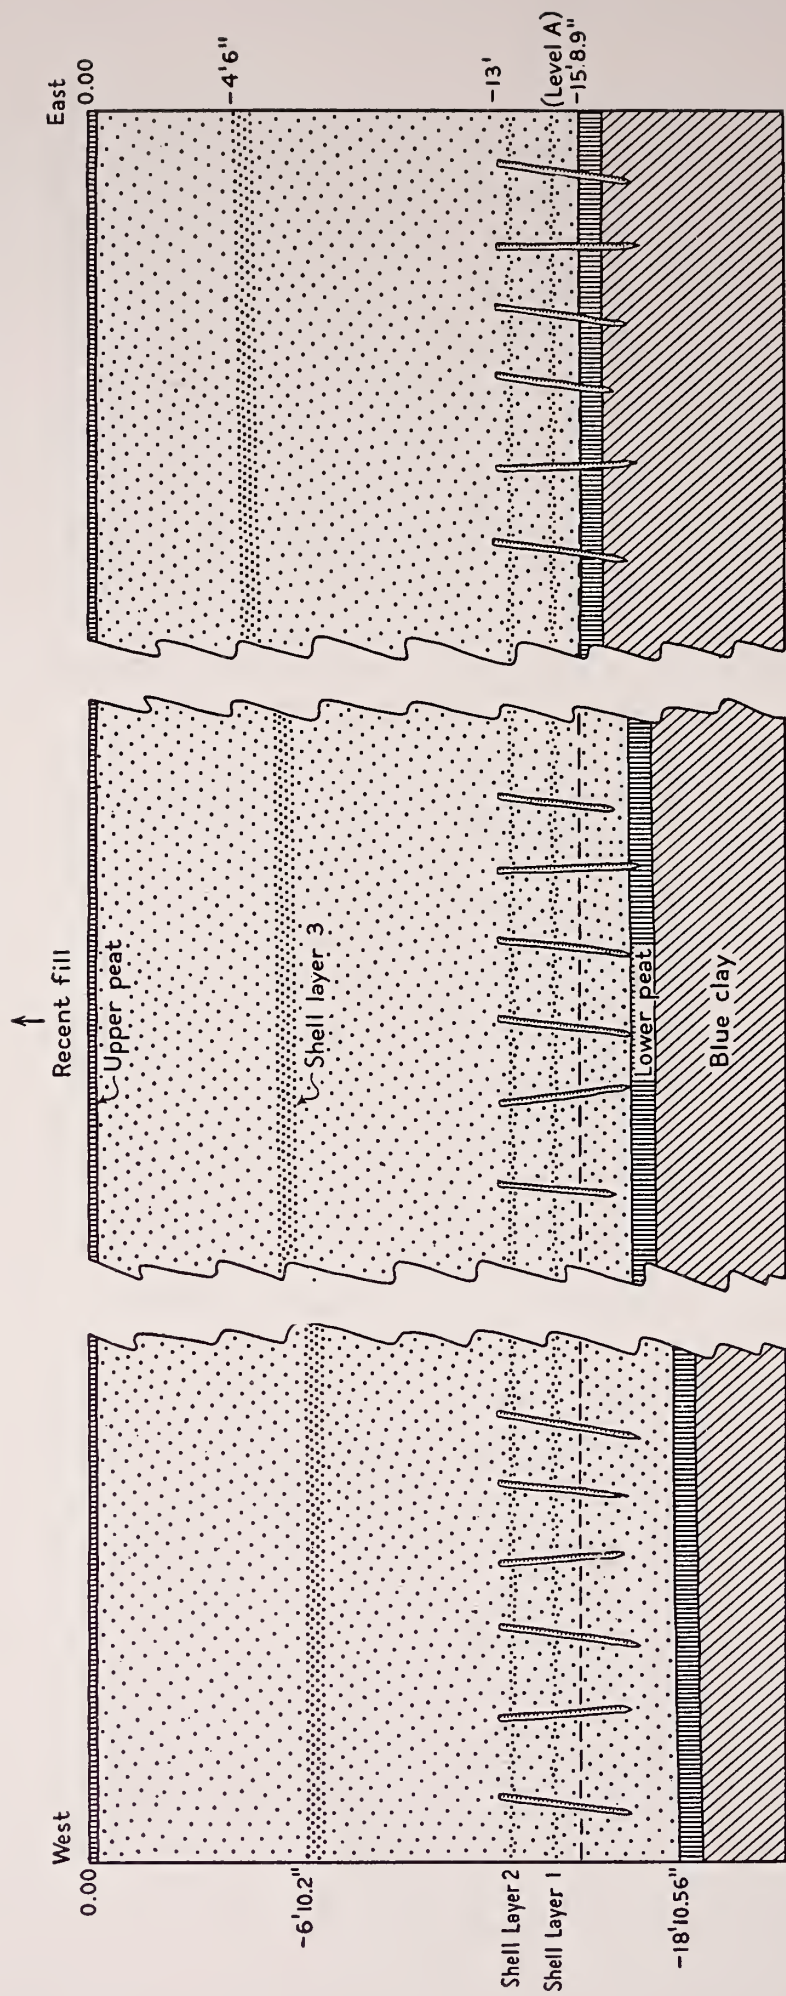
Diagrammatic east to west cross section of the building excavation. For description see pp. 29-32.
